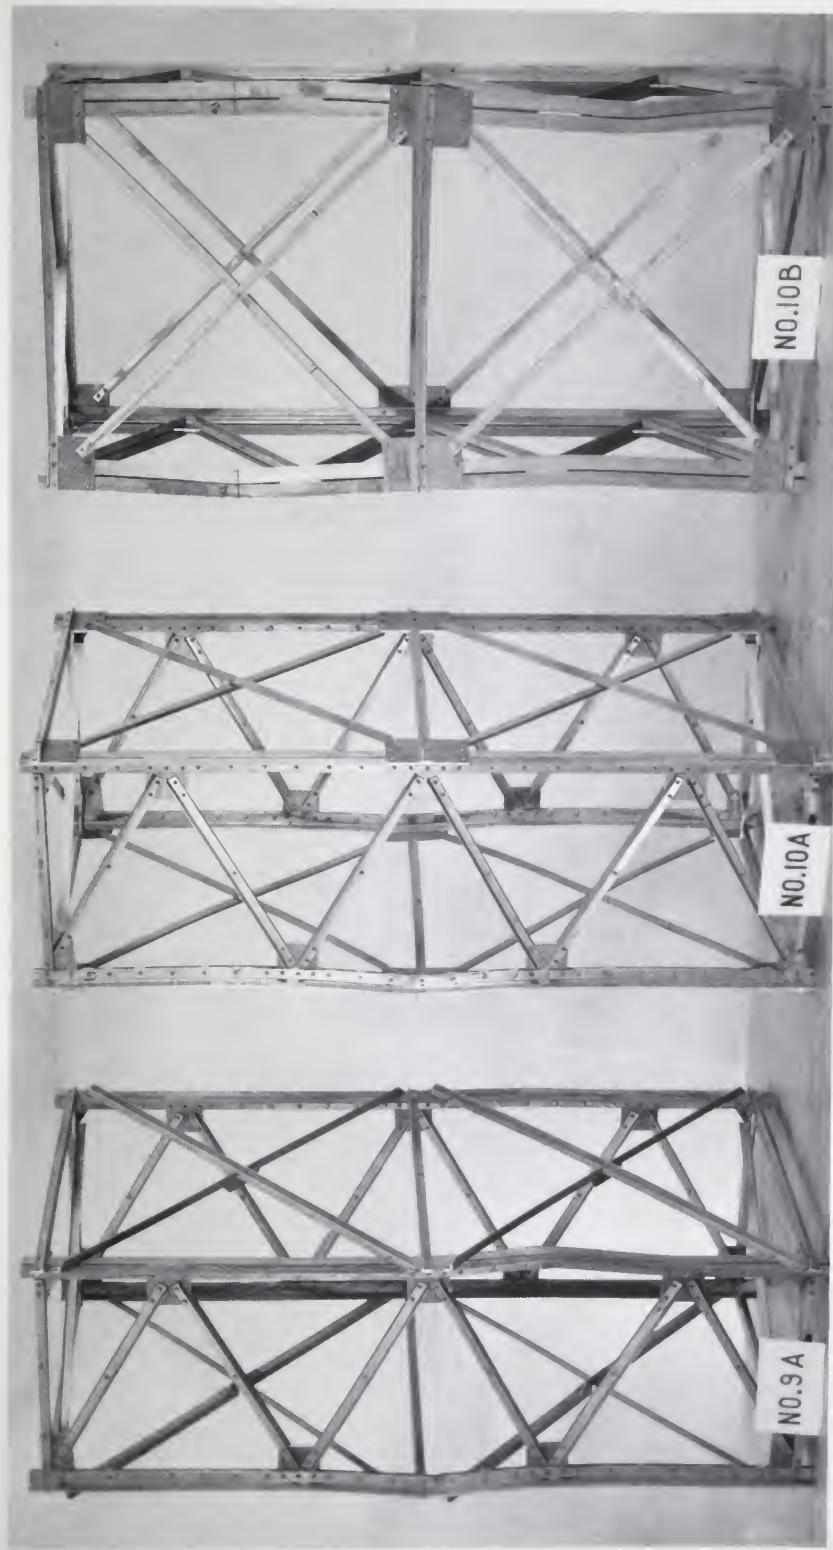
FRAMES NO. 9A, 10A AND 10B AFTER FAILURE IN COMPRESSION TEST.
